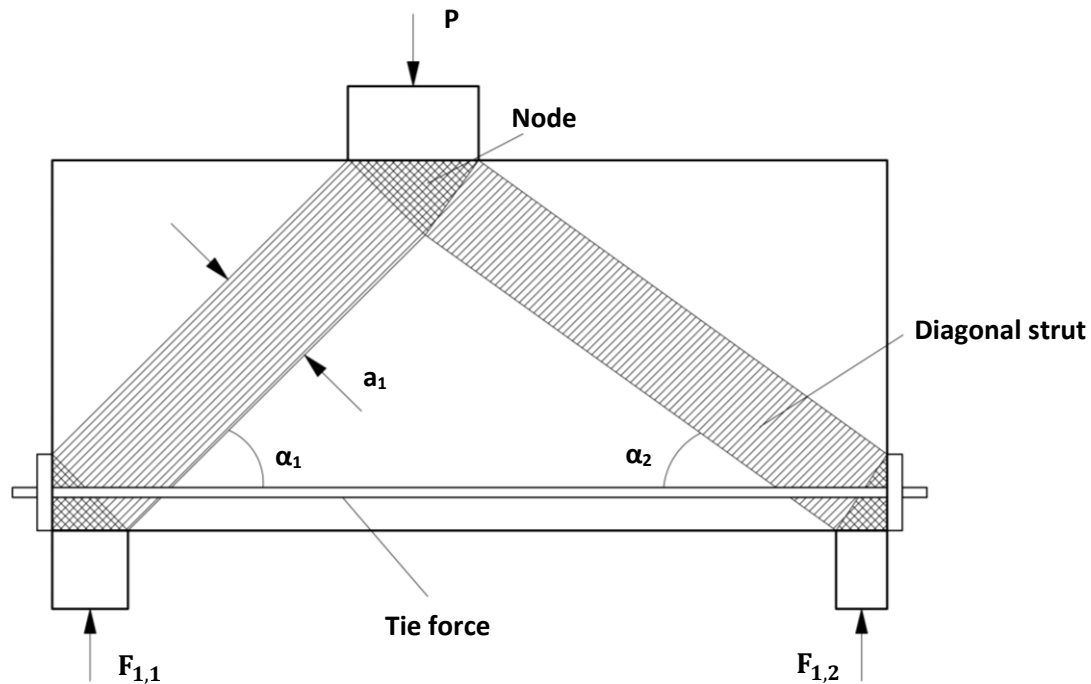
Example of strut-and-tie model of a deep beam under a three-point load. Adapted from ACI Section 10.7.1 For Deep Beam.
